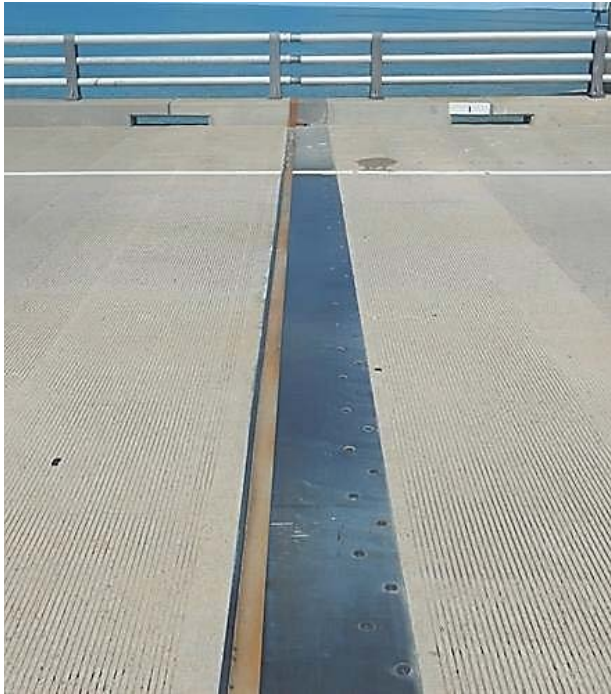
NCB-NB Pier 1 Assembly Joint without Seal – Sliding Plate Expansion Joint Typical Condition with Minor and Isolated Locations of Freckled Rust (Looking West)
